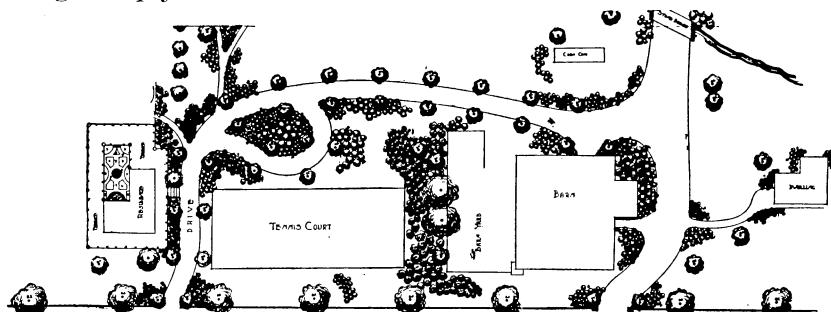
A plan for a farmstead when a good house, barn, and tenant house were already erected close to the public road.
